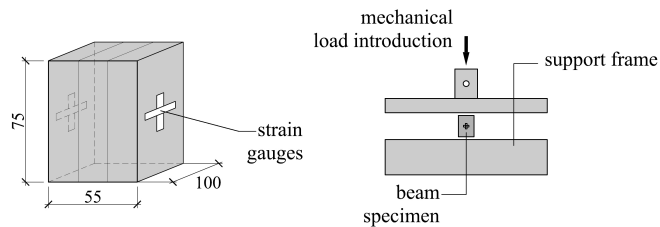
Specimen and scheme of test set-up used for compression test on timber type A.
